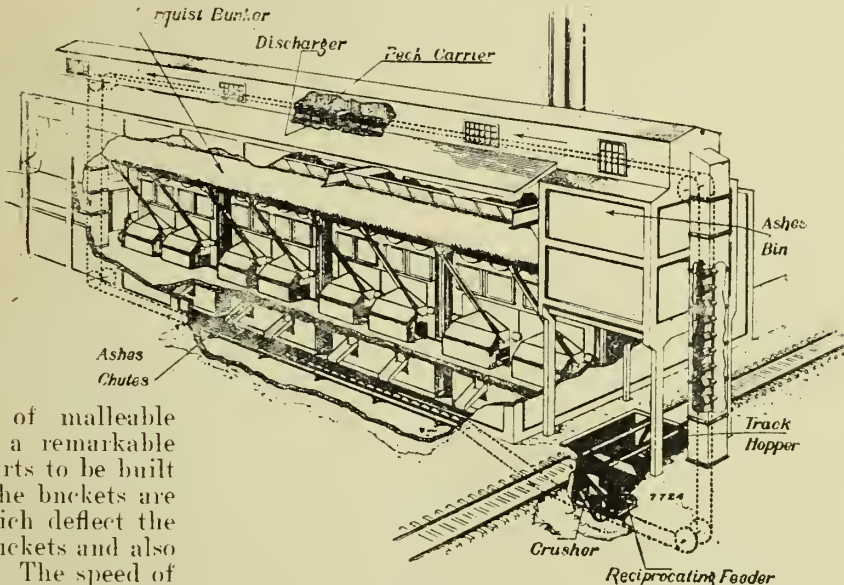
Typical Boiler House equipped with Overhead Coal and Ash Bins—Spouts to Stokers and Pivoted Bucket Carrier for handling both Coal and Ashes.
